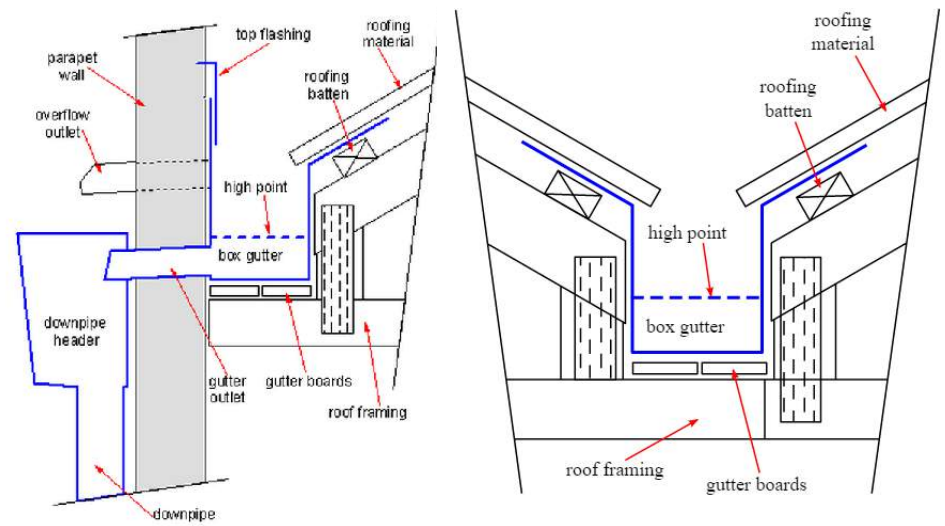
Sectional drawings of a box gutter behind a parapet and at a valley between two roof sectio. Image courtesy of Wikimedia Commons, 2015
